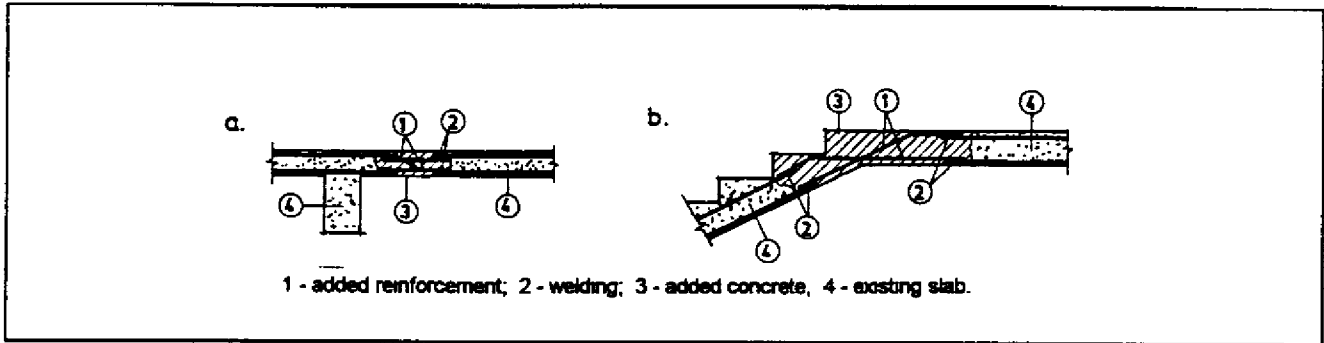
Reinforcement of Floor Slabs or Staircase Slabs
